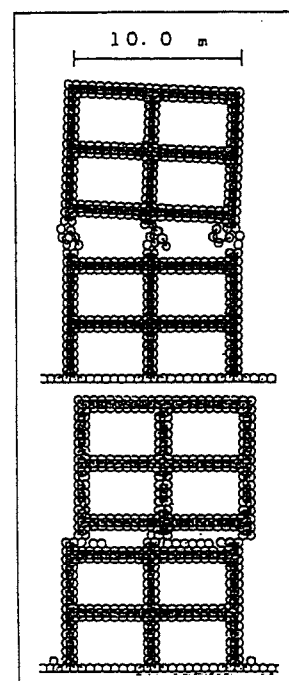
EDE simulation of the damage to an intermediate floor collapse-type
